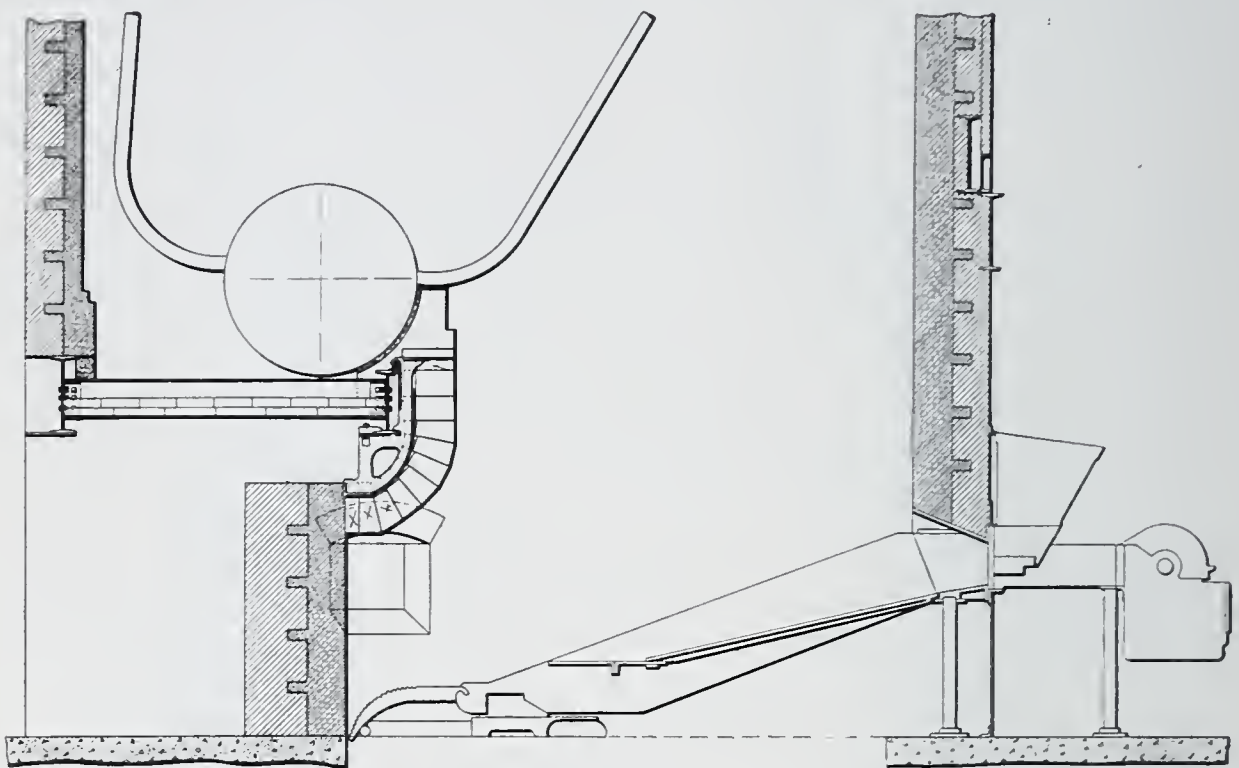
Suspended Arch Used as Overhanging Bridge Wall with Connelly Boiler and Underfeed Stoker.
